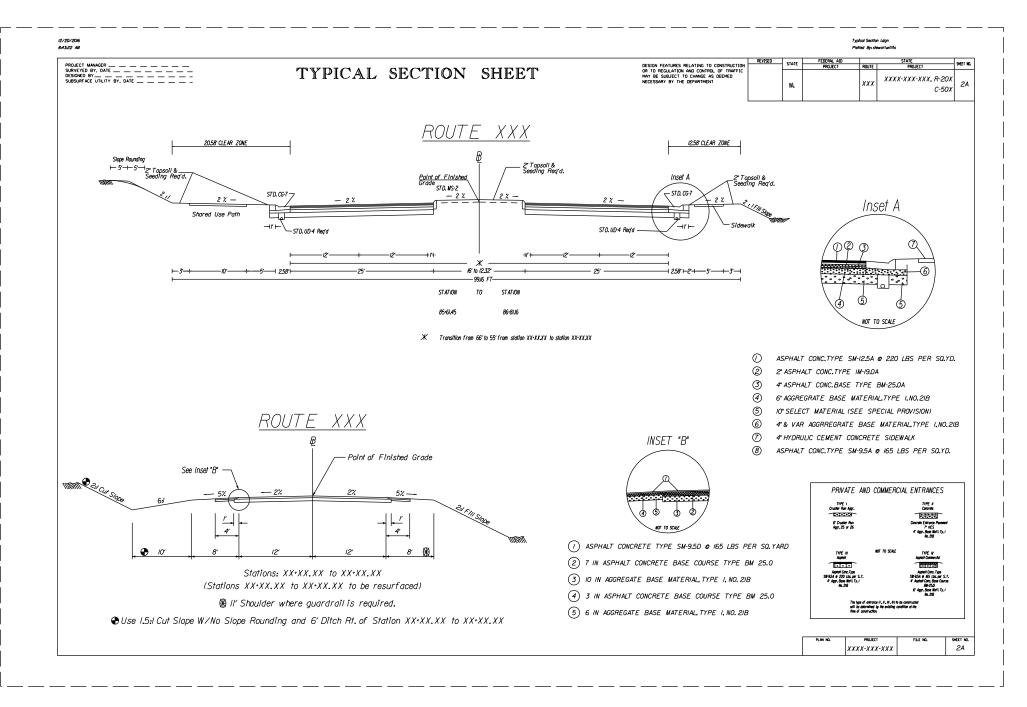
H - 16 SAMPLE TYPICAL SECTION SHEET
